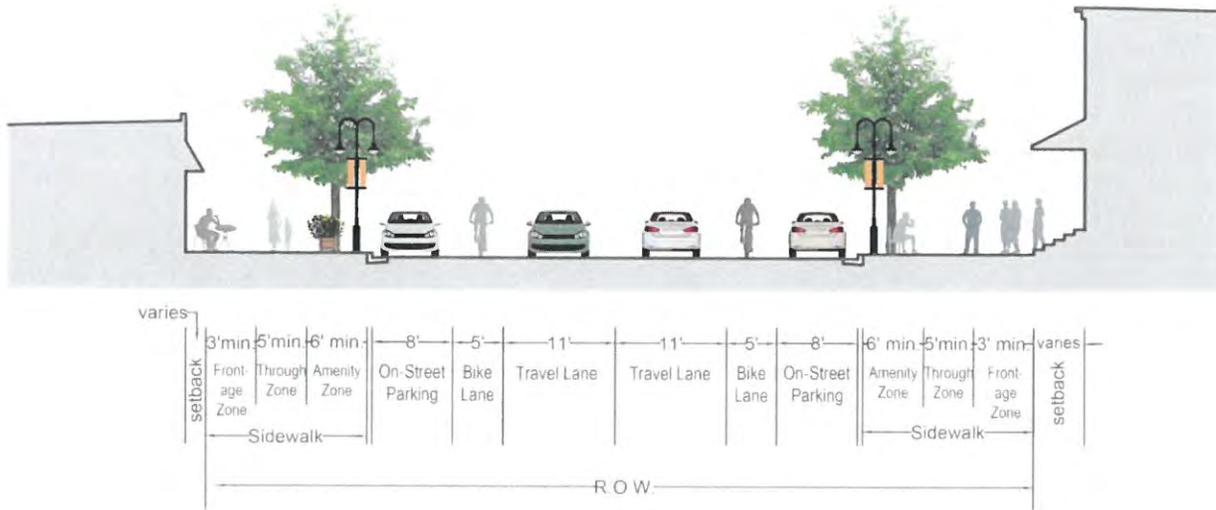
Cross Section Concepts for Streets in the Mixed Use Residential District
